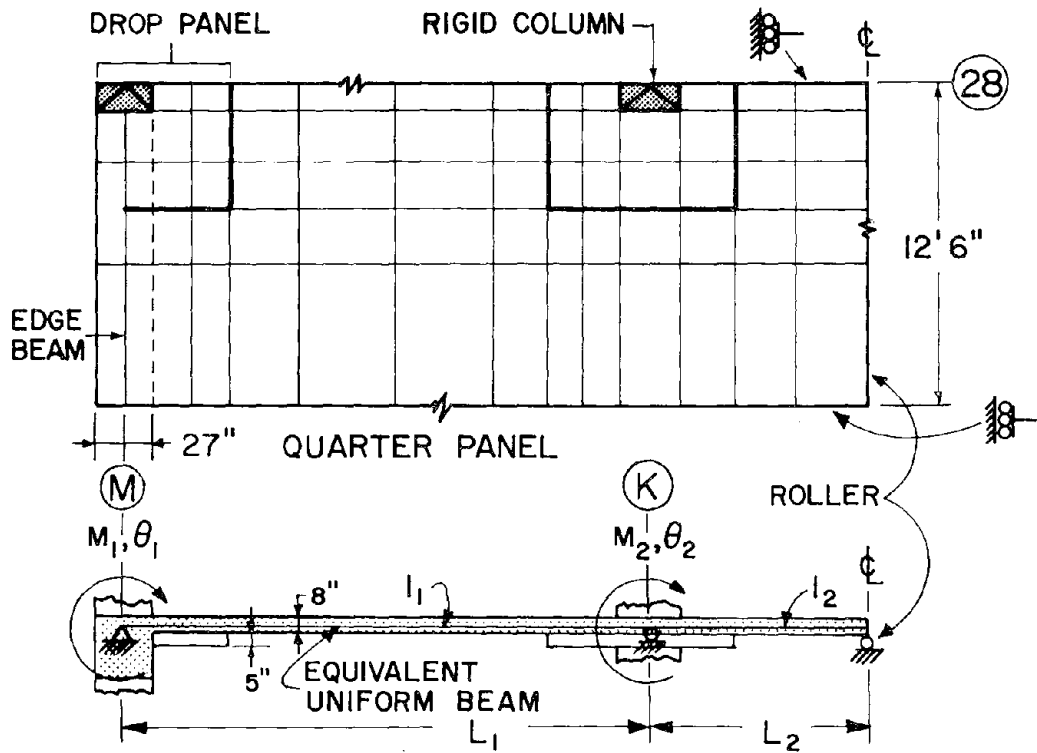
FINITE ELEMENT MODEL 2-FRAME 28 SLAB
